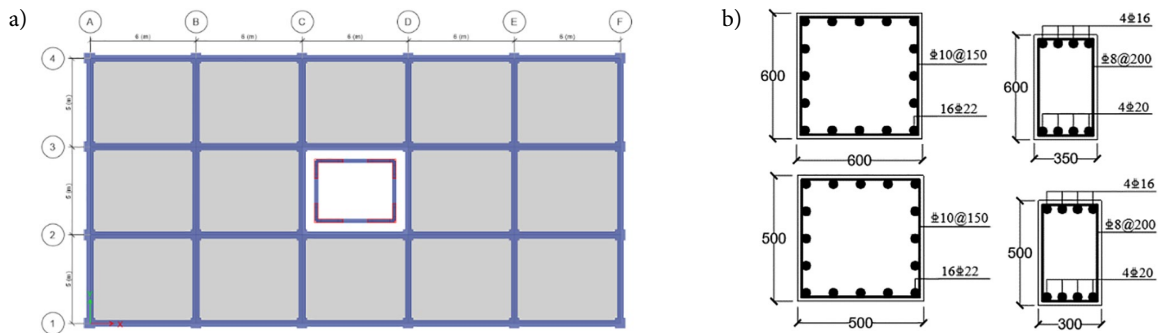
New staggered story isolated structure diagram: a – structural plane diagram; b – structural reinforcement drawing
